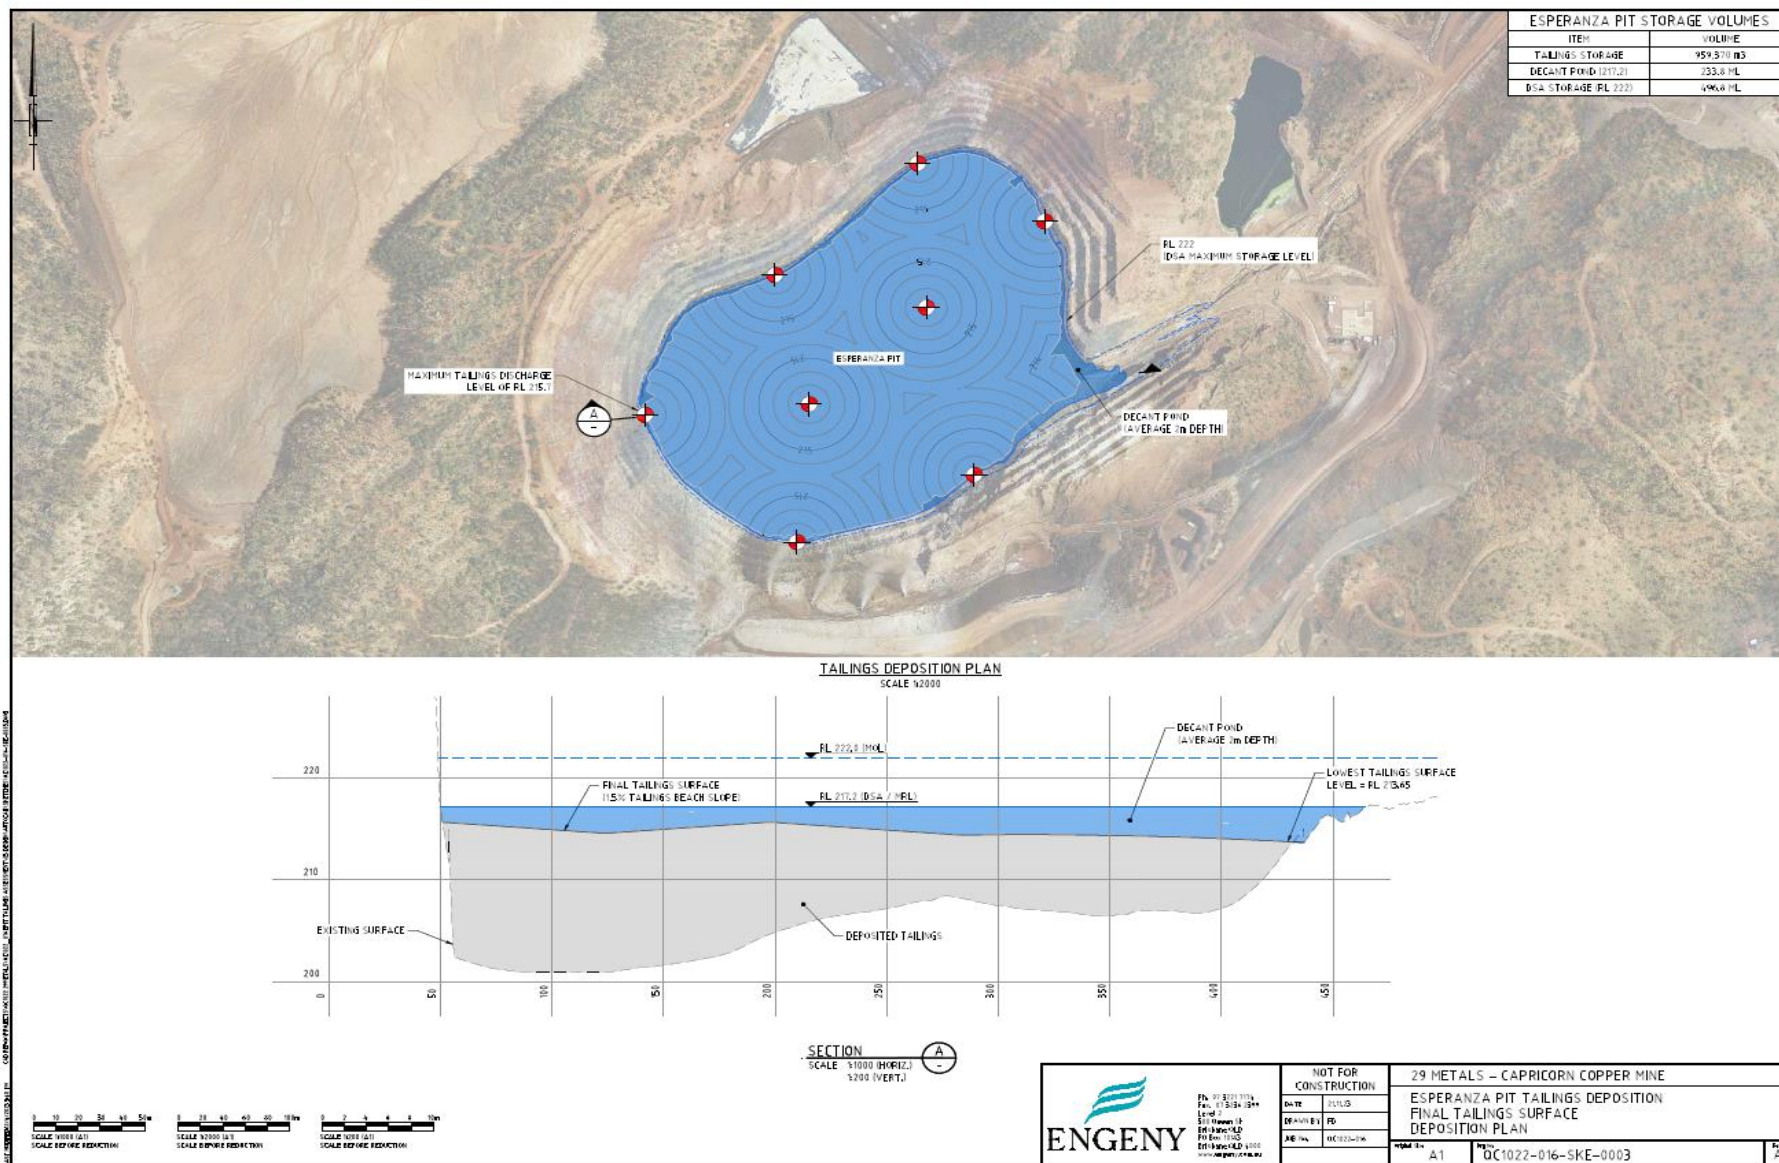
Esperanza Pit Tailings Deposition – Final Tailings Surface Deposition Plan
